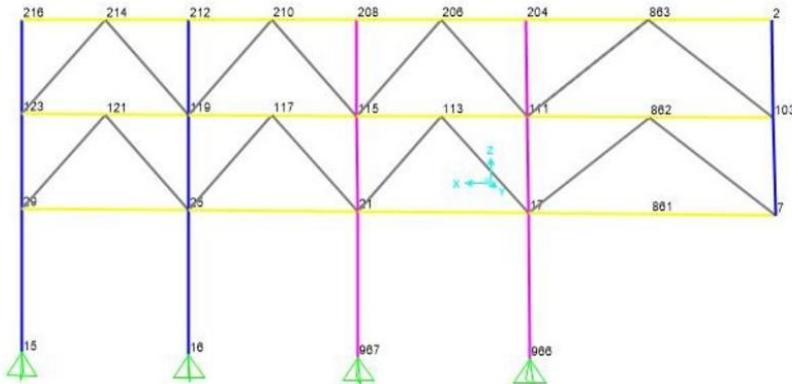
Section Properties - PROPOSAL 2 – North View
